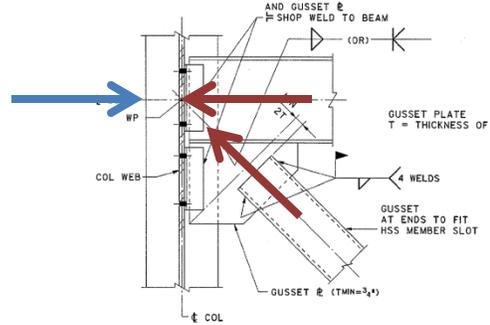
Lateral load path through a HSS cross braced connection. Courtesy of RIT.
